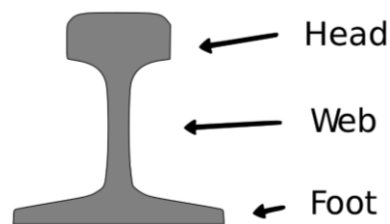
Typical rail cross-section (Wikipedia, 2010)
